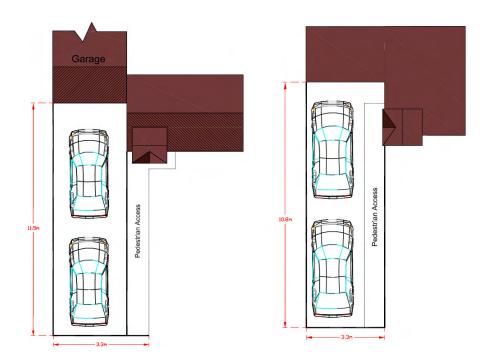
Left-hand Image - Minimum parking area dimensions in front of a garage and pedestrian access. Right-hand Image - Minimum parking area dimensions in front of a wall and pedestrian access.
